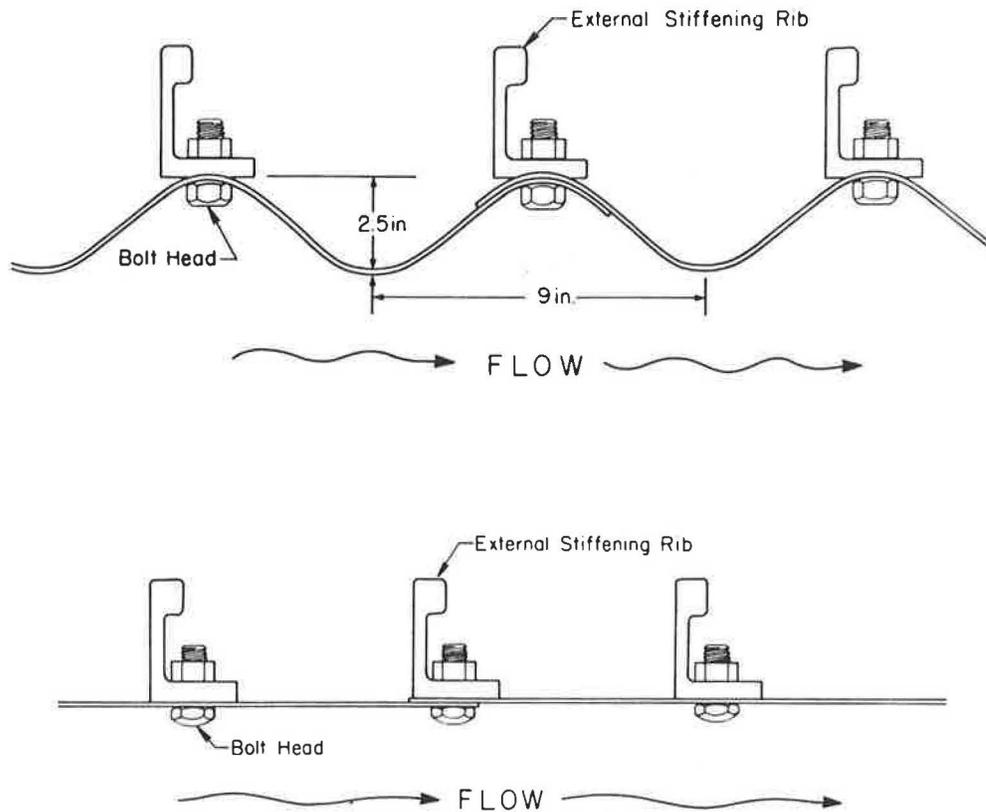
Schematic illustration of corrugated box culvert and smooth-walled box structure wall configurations.
